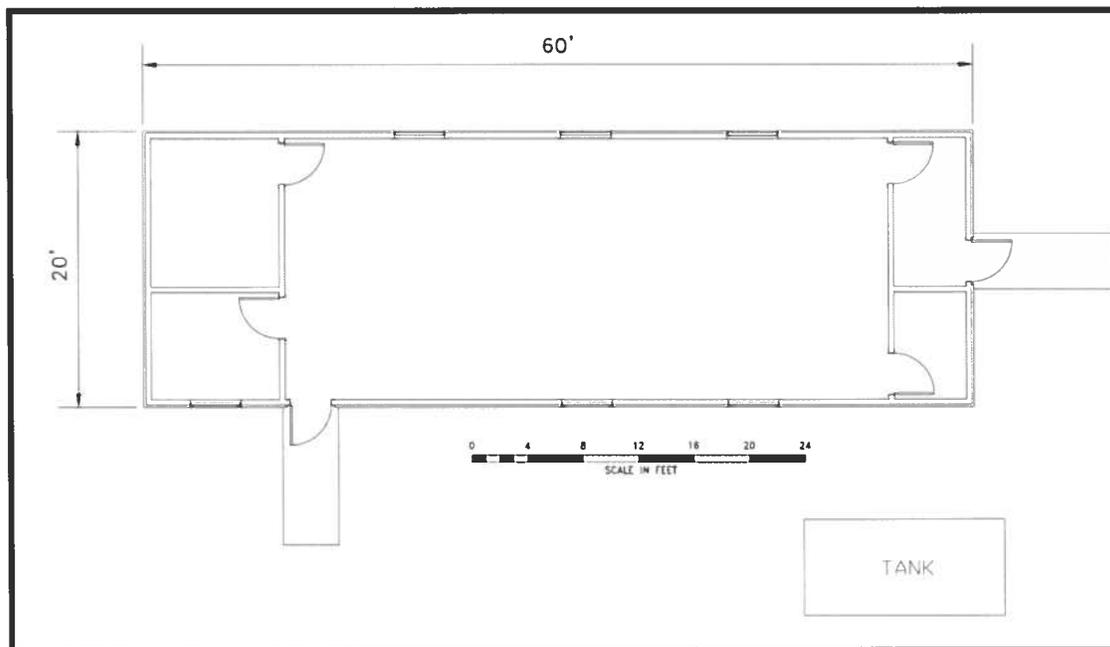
Newtok FSRC floorplan, showing slight variation in typical layout of FSRC interior.
